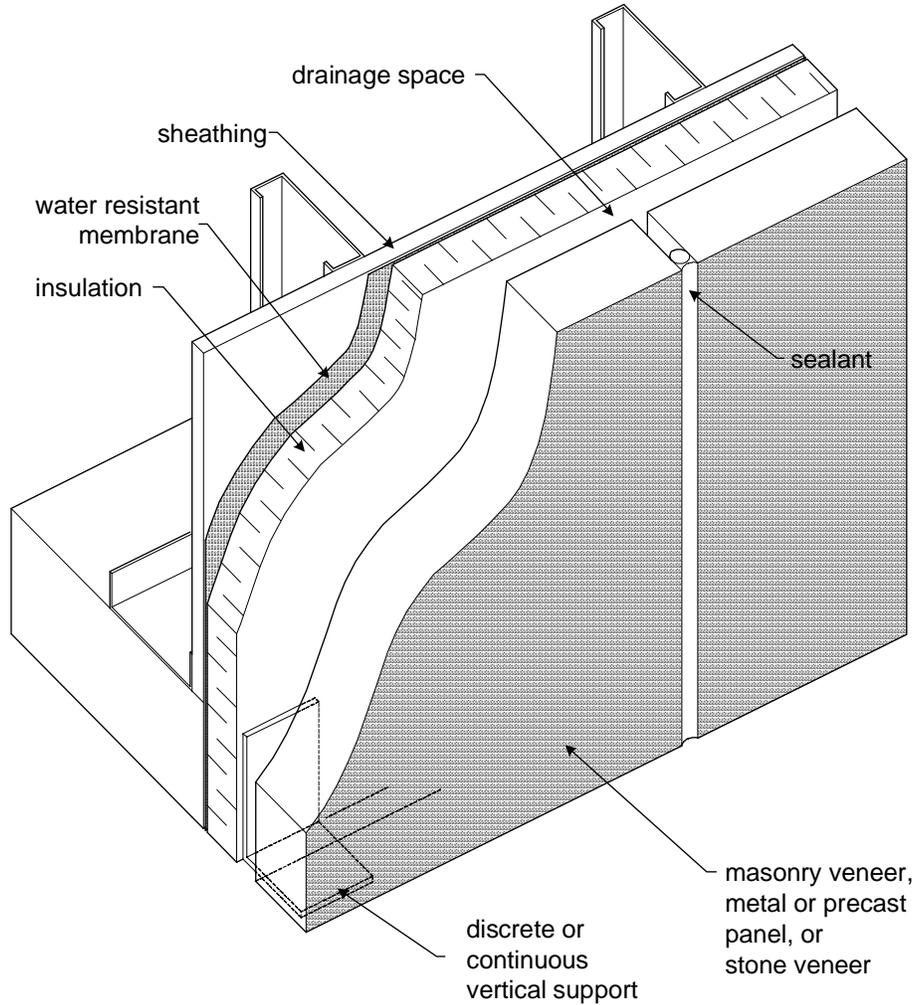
Representative Drained Masonry Veneer, Metal or Precast Panel, or Stone Veneer System
